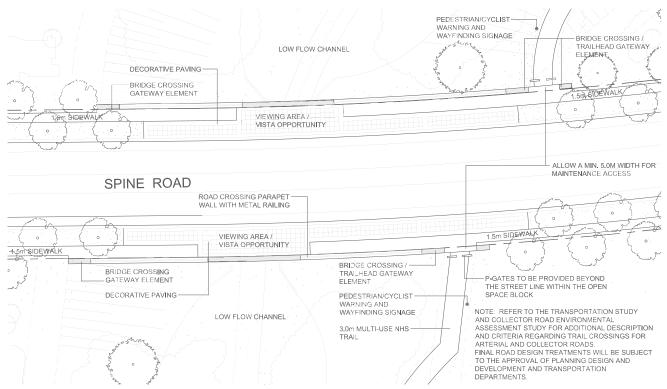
Conceptual plan option of trail treatment at collector roads, as well as bridge crossing treatment and viewing opportunity.
